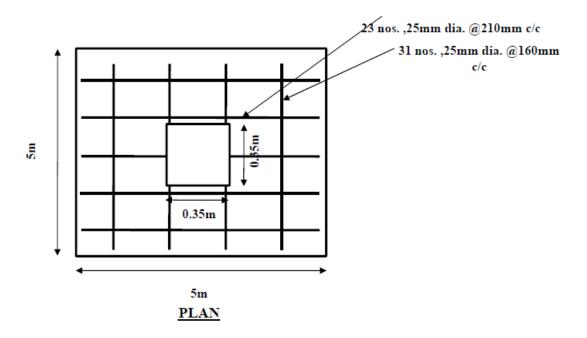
8 Spread sheet sowing dimensions of spread footing
